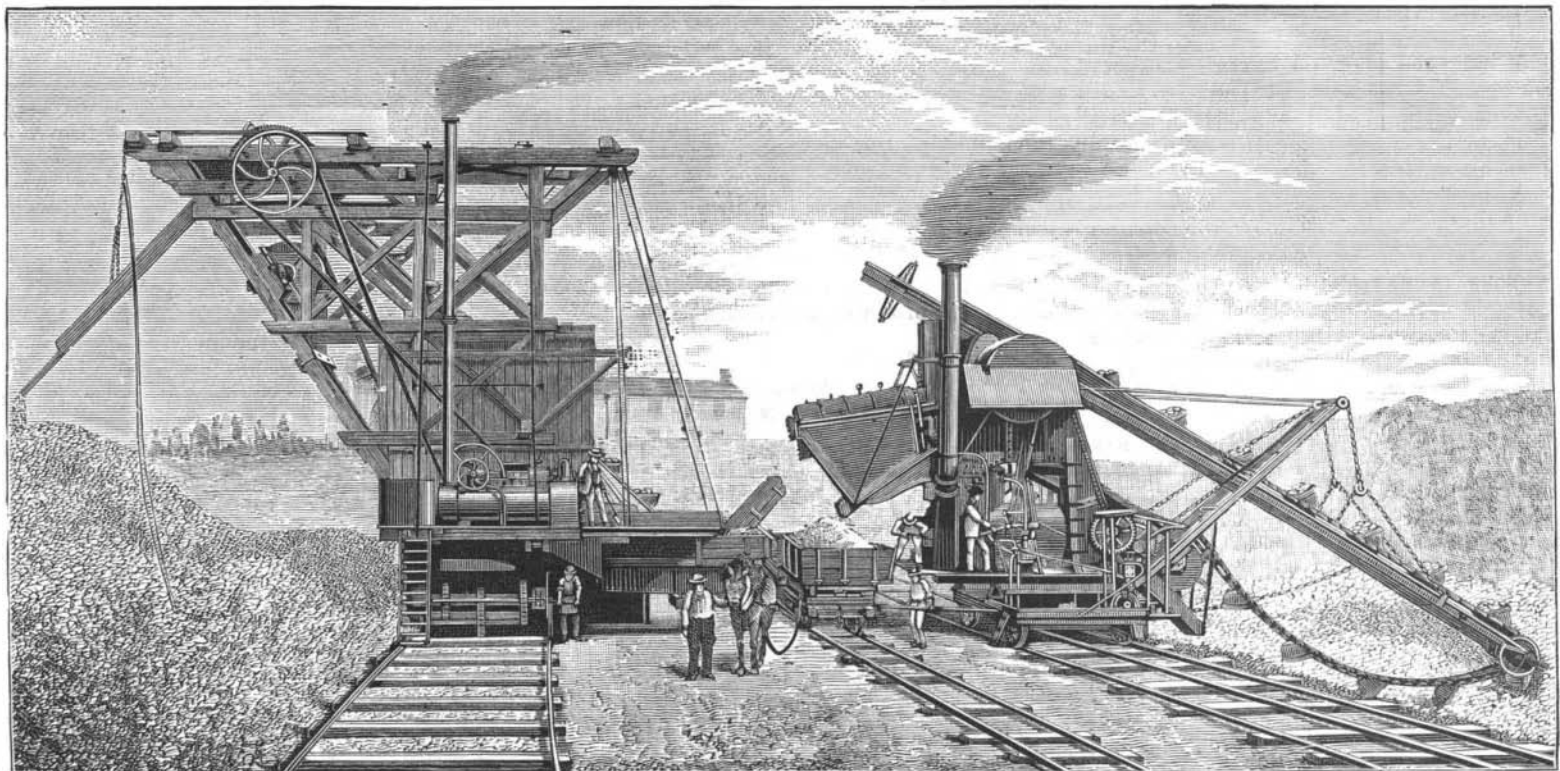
GENERAL VIEW OF AN EXCAVATOR AND ELEVATOR AT WORK IN A BALLAST QUARRY.
